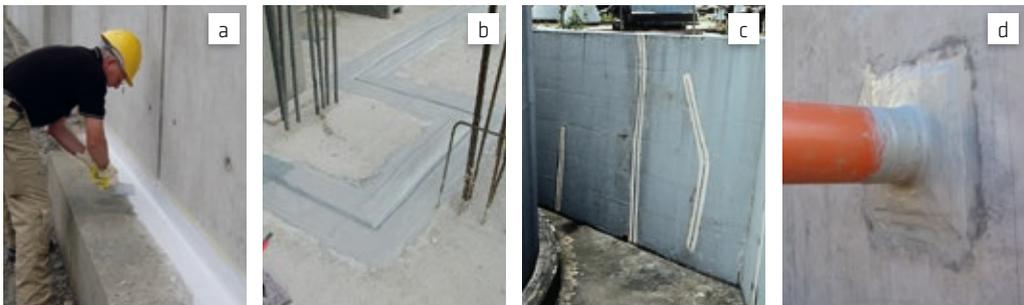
Typical examples of over-banding sealing systems (waterproofing of a: a construction joint, b: an expansion joint, c: cracks, d: a pipe penetration)
